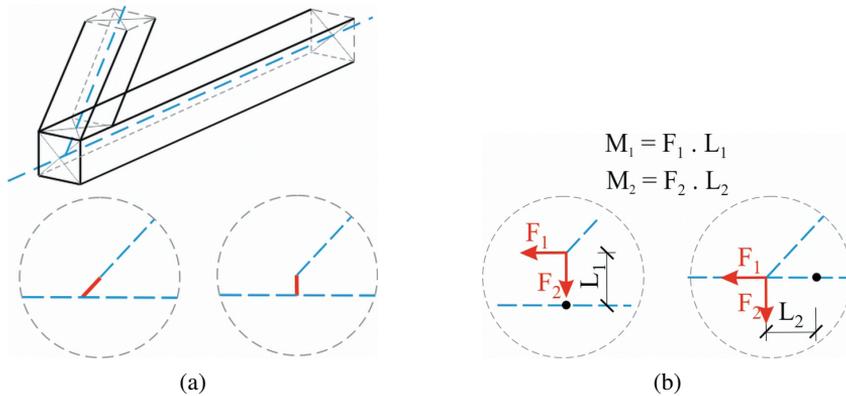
Modelling of the connection of inclined and horizontal elements of the roof truss [28]:
